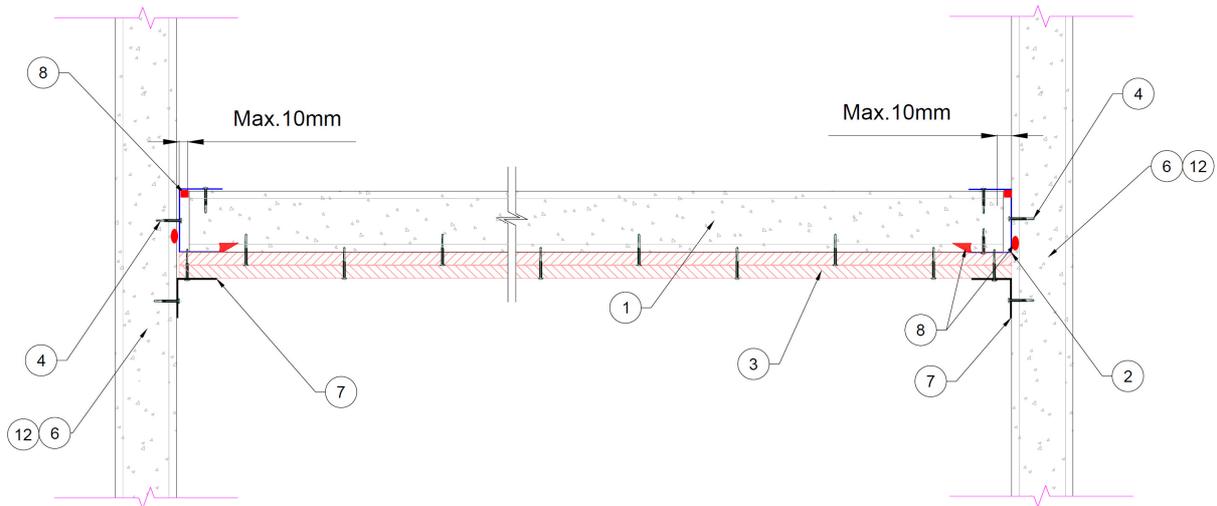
Speedpanel ceiling protected with plasterboard lining (Longitudinal Section View)
